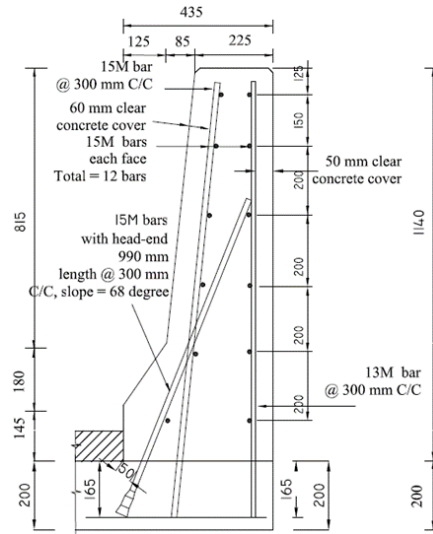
View of the proposed MTQ PL-3 barrier with 200-mm thick deck slab, 165 mm bar embedment in the deck and 435 mm base width
